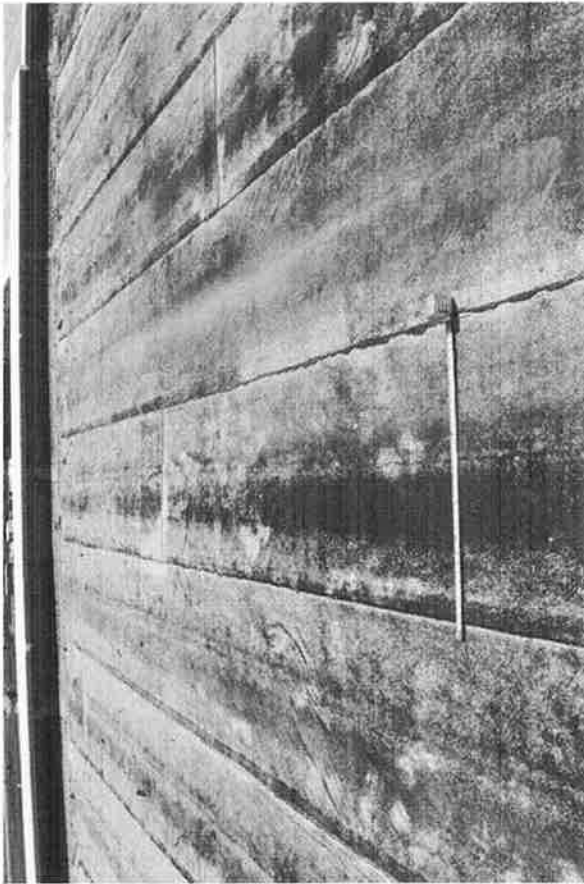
View of aged and deteriorated mod-bit roofing (typical)
